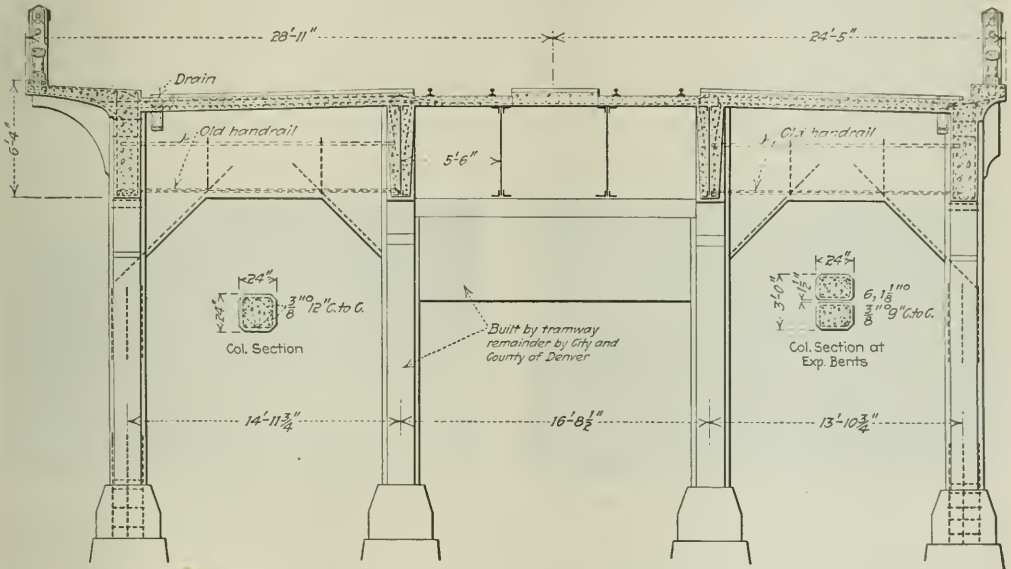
TYPICAL SECTION OF ALL-CONCRETE REPLACEMENT
